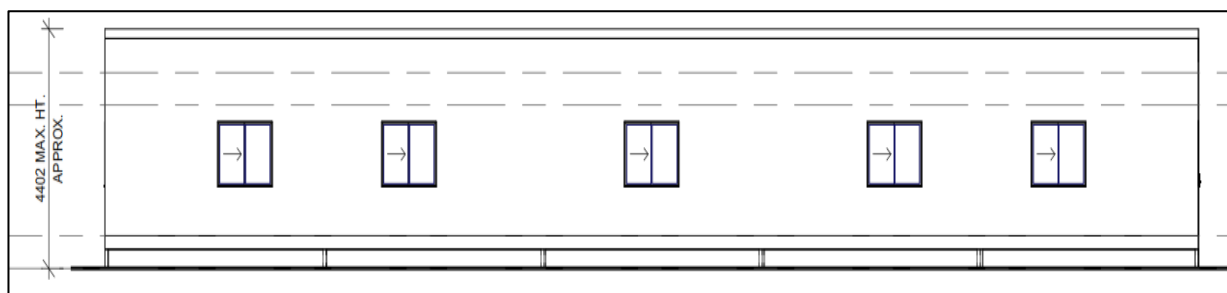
Gym Module Elevation (Source: The Design House NQ, 2026)
